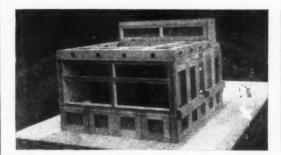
(far left). Exterior view of model laboratory room showing side window and lantern-type roof-light. Fig. 3 (left). Interior view of model laboratory room showing position of roof-light. Fig. 4 (below). Plan and section of laboratory room.
